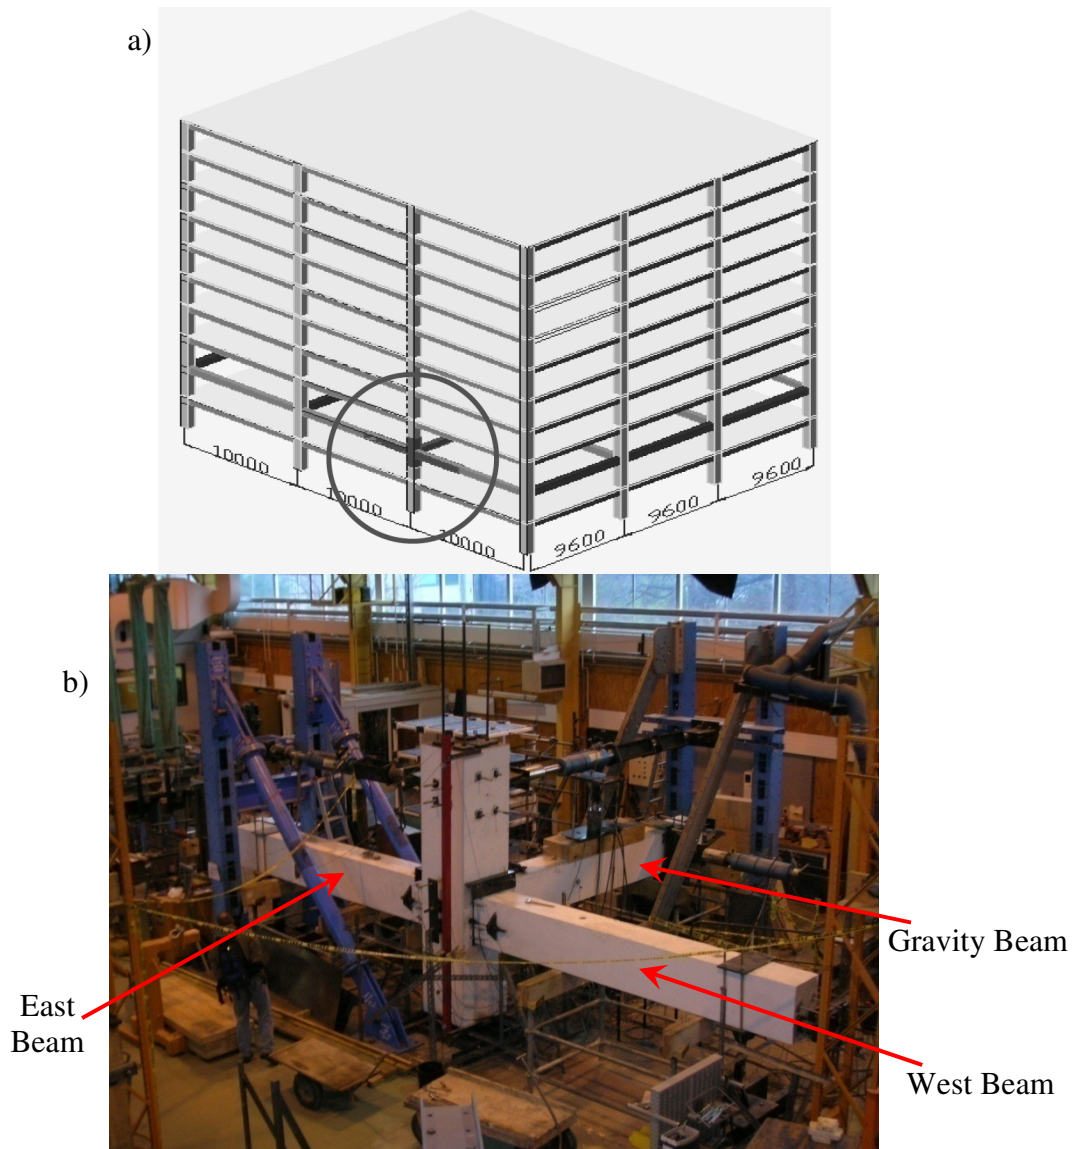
a) Prototype structure showing location of subassembly (Li et al. 2008);
